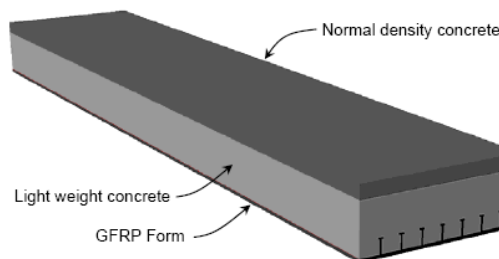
Sandwich panel comprising a GFRP SIP formwork and concrete (Keller *et al.* 2007)
